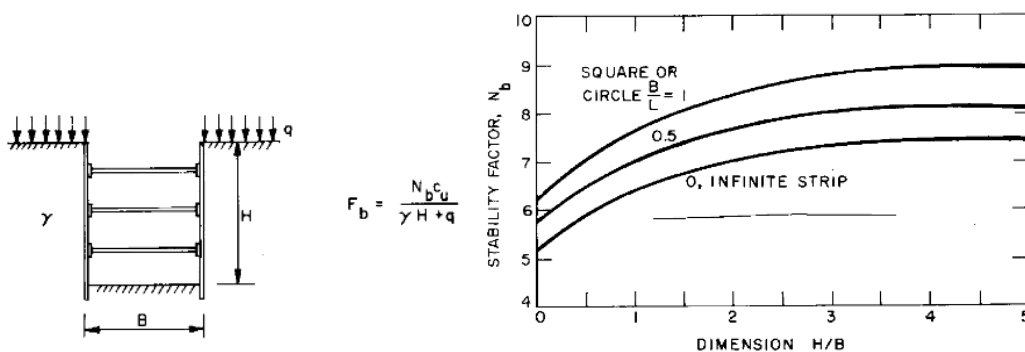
Base heave stability in supported retaining wall (Bjerrum and Eide, 1956)
